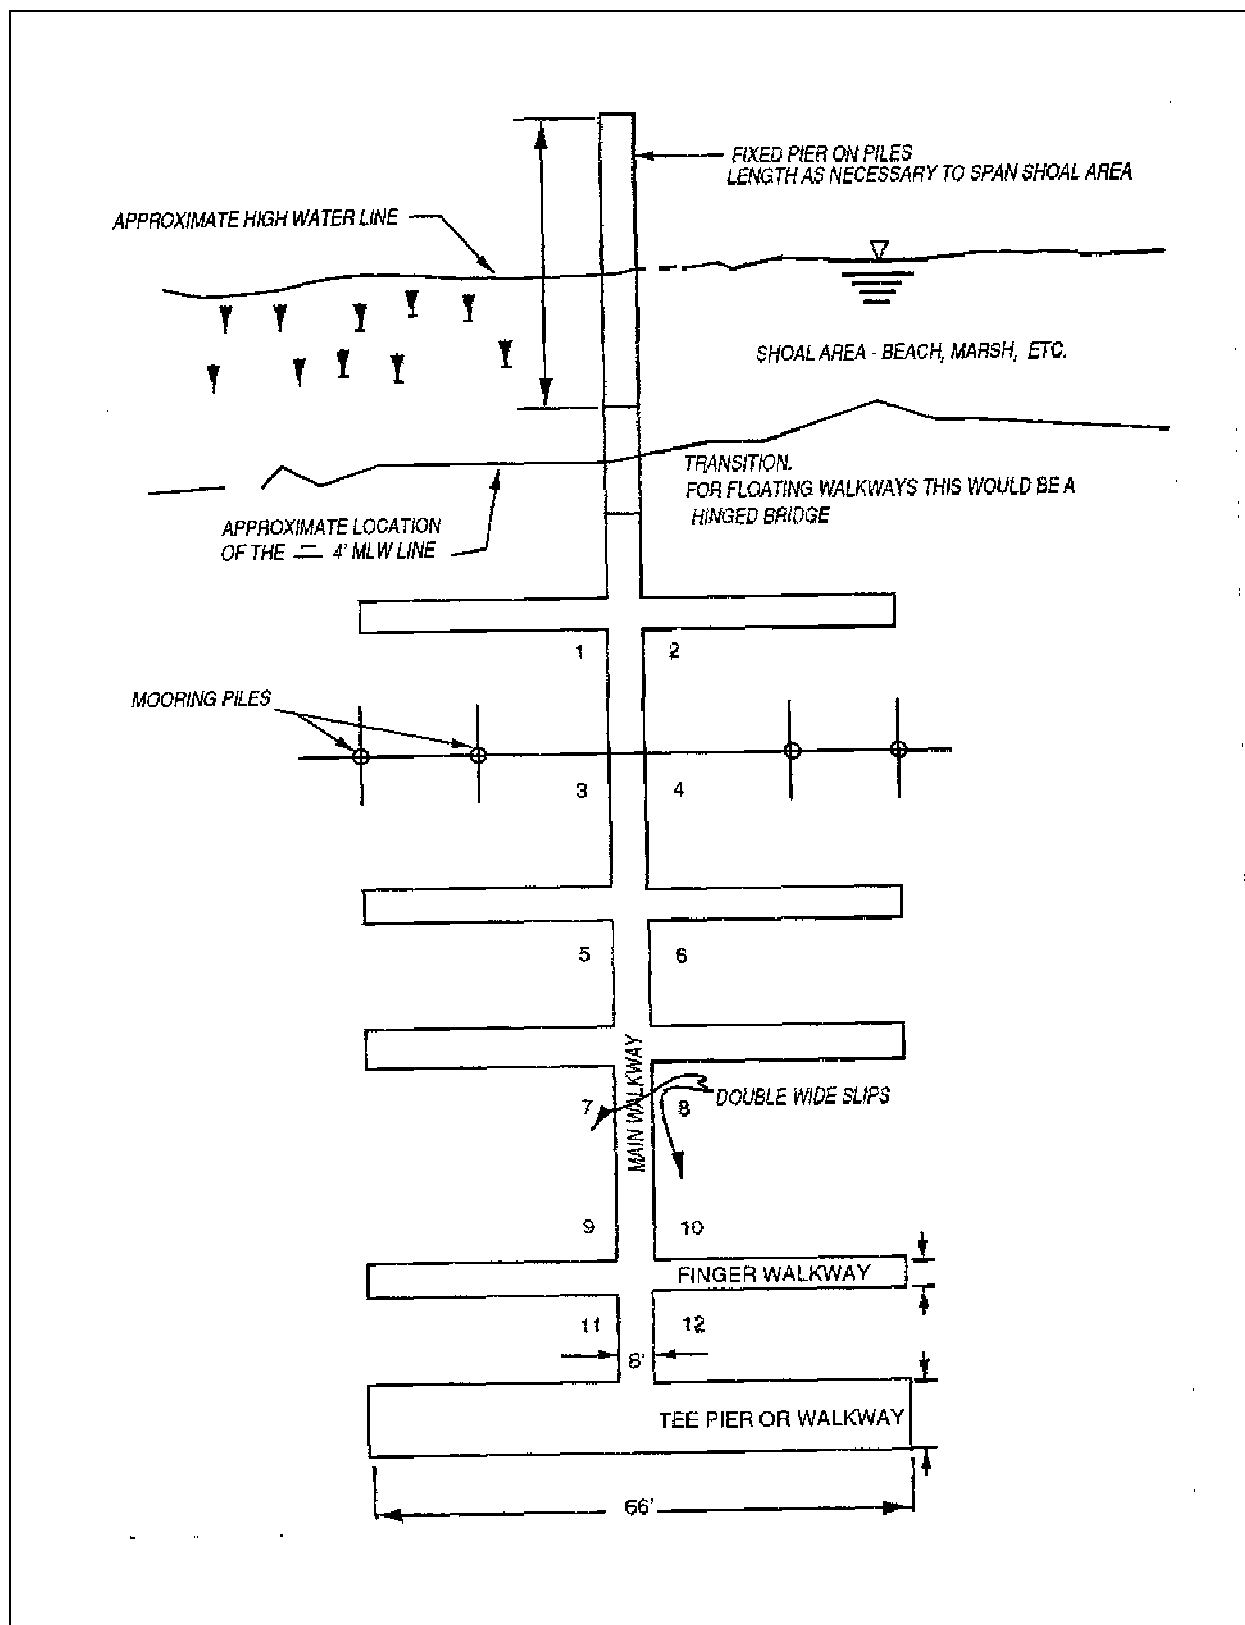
Basic layout for marina walkways (Chamberlain 1983)
